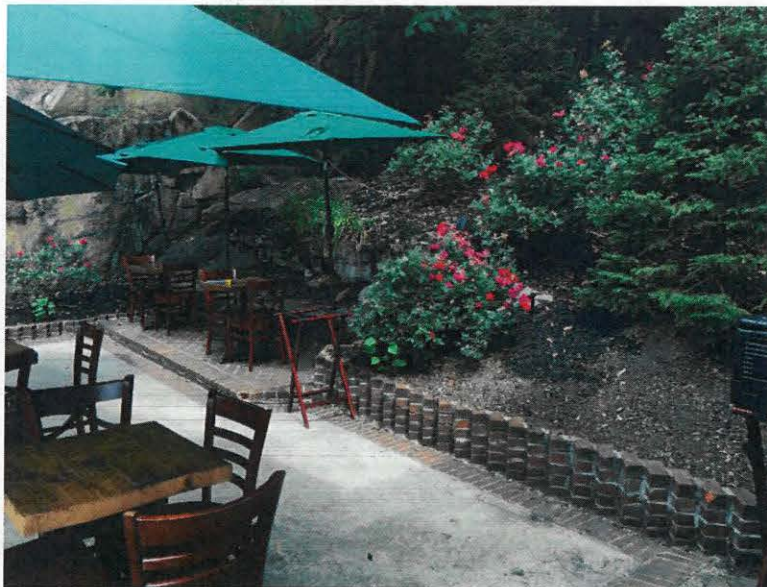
Photo taken July 2020. Low brick retaining wall to be removed.
